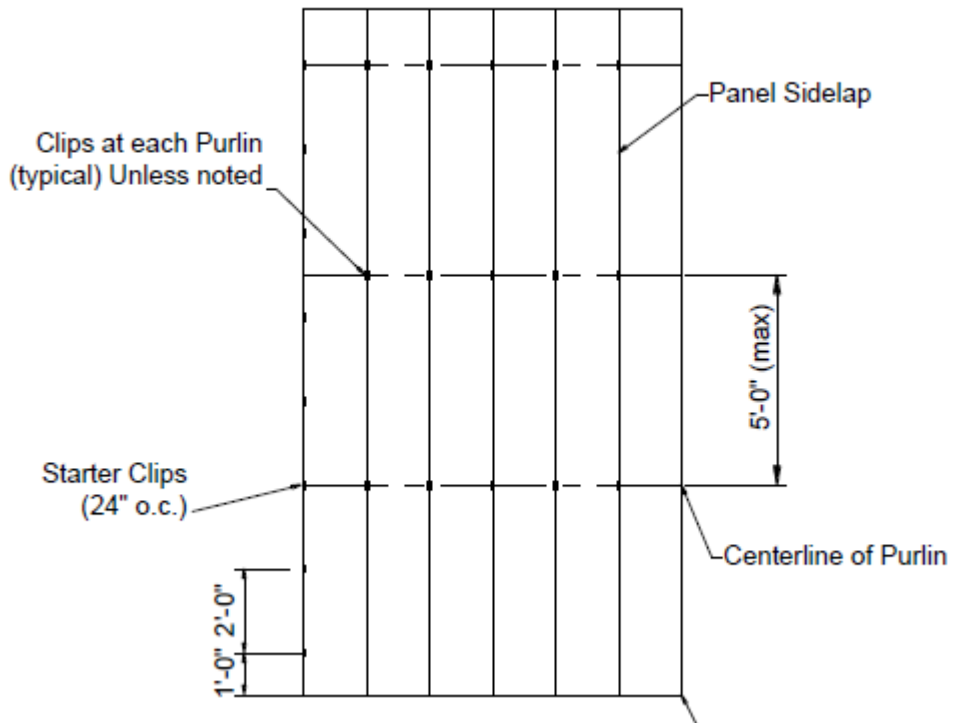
Minimum 24 Gauge Mueller Trapezoidal Lock (MTL) Panel Fastener Pattern
